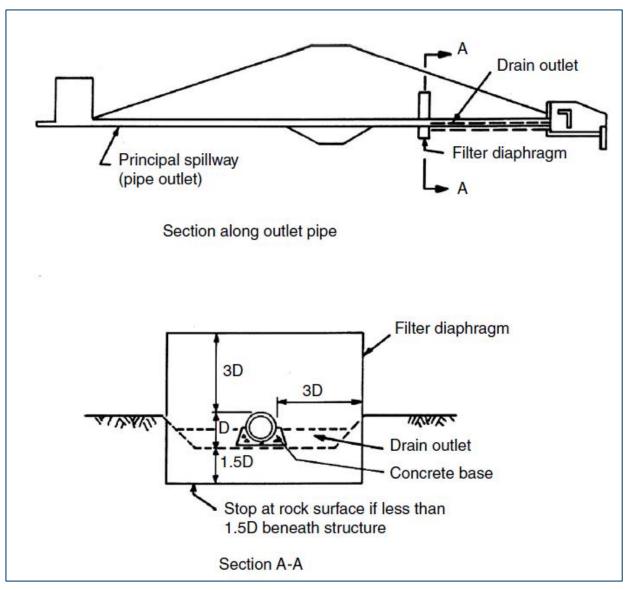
Filter diaphragm for seepage and piping control around outlet pipe¹⁷
